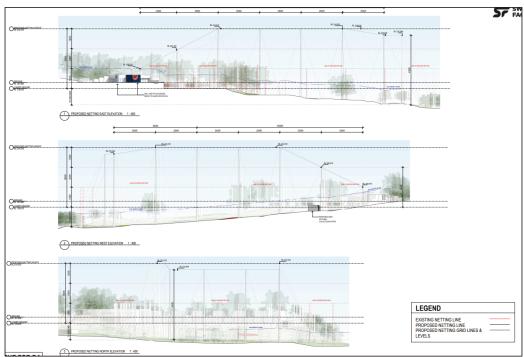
Proposed Height Non-Compliance - Elevation (Source: SBA Architects, 2023)
